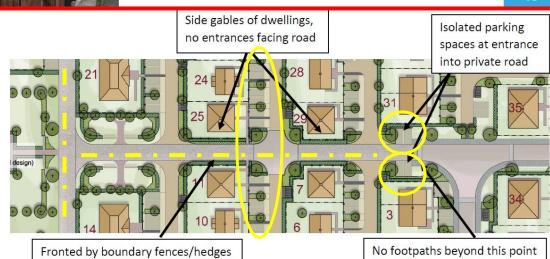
Extract from Site Layout Plan showing treatment along secondary route
